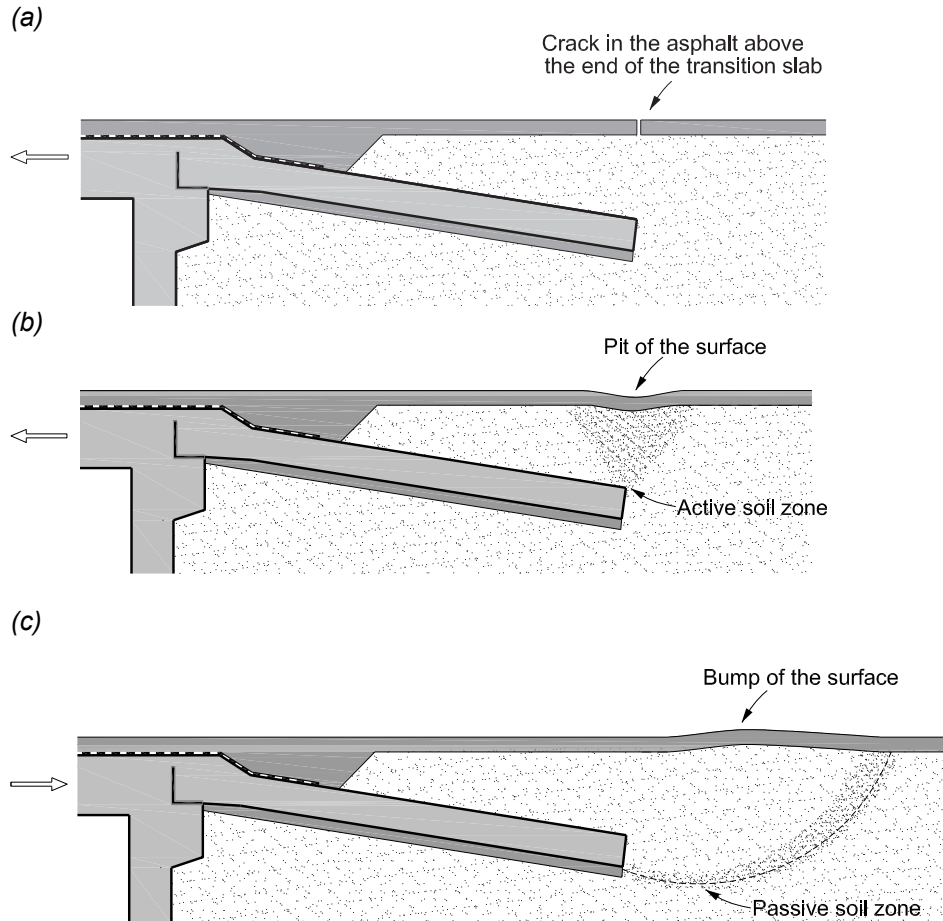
Potential problems on the pavement: (a) crack due to bridge shortening; (b) settlement above the end of the transition slab due to bridge shortening; (c) uplift due to bridge elongation
